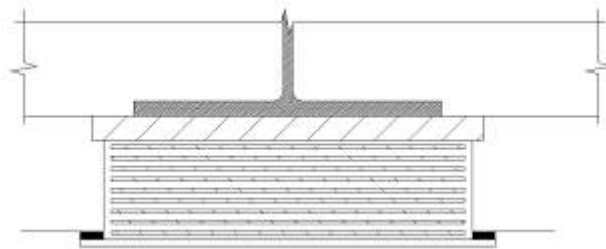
EXPANSION JOINTS AND DECK JOINTS
